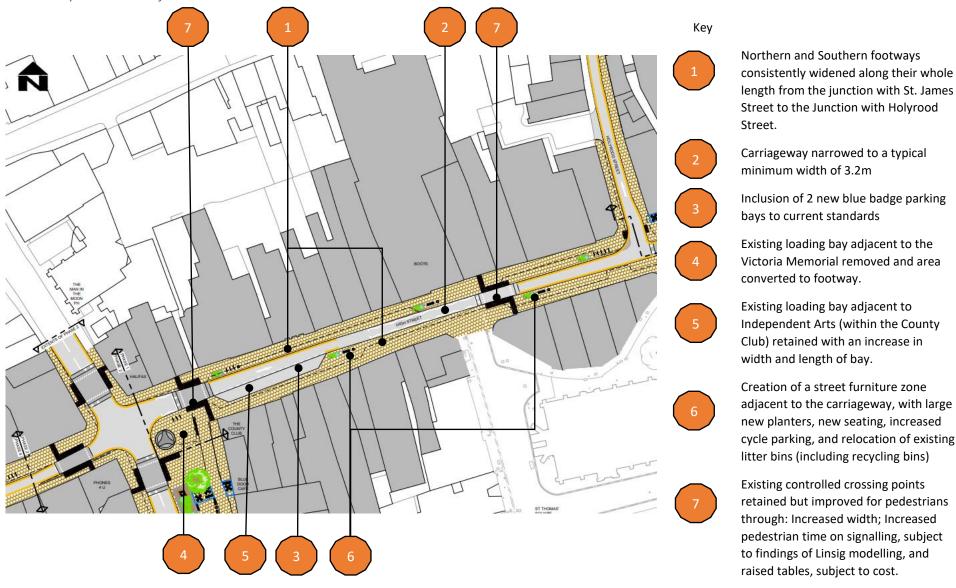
Plan of the High Street from St. James' Street Junction to Holyrood Street Junction
